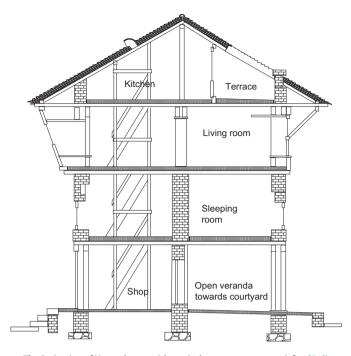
Section of Newar house with vertical space arrangement (after [21]).
